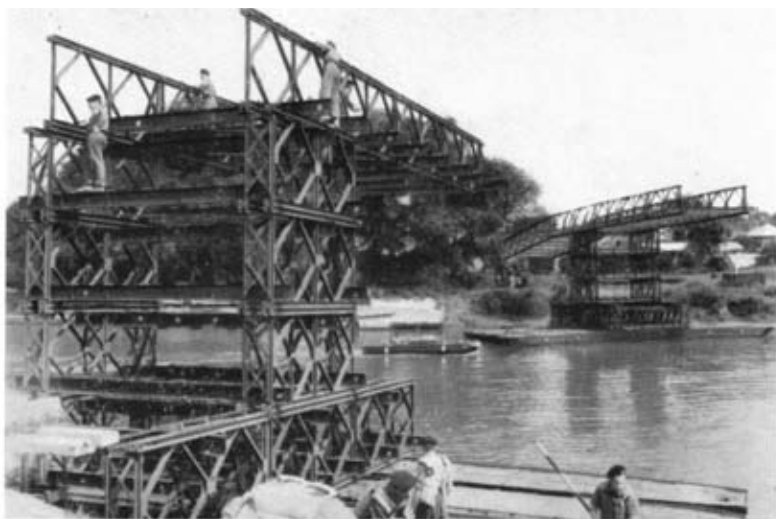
Building the piers on the pontoon rafts, showing the cantilevered portions of the bridge.
